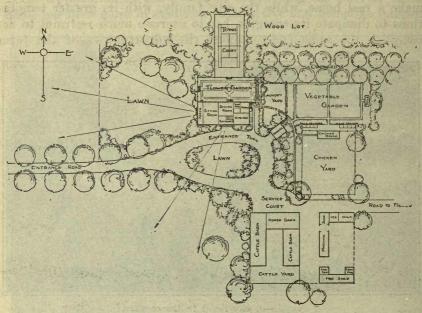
A plan for a farmstead where the buildings are back from a north-andsouth road.
